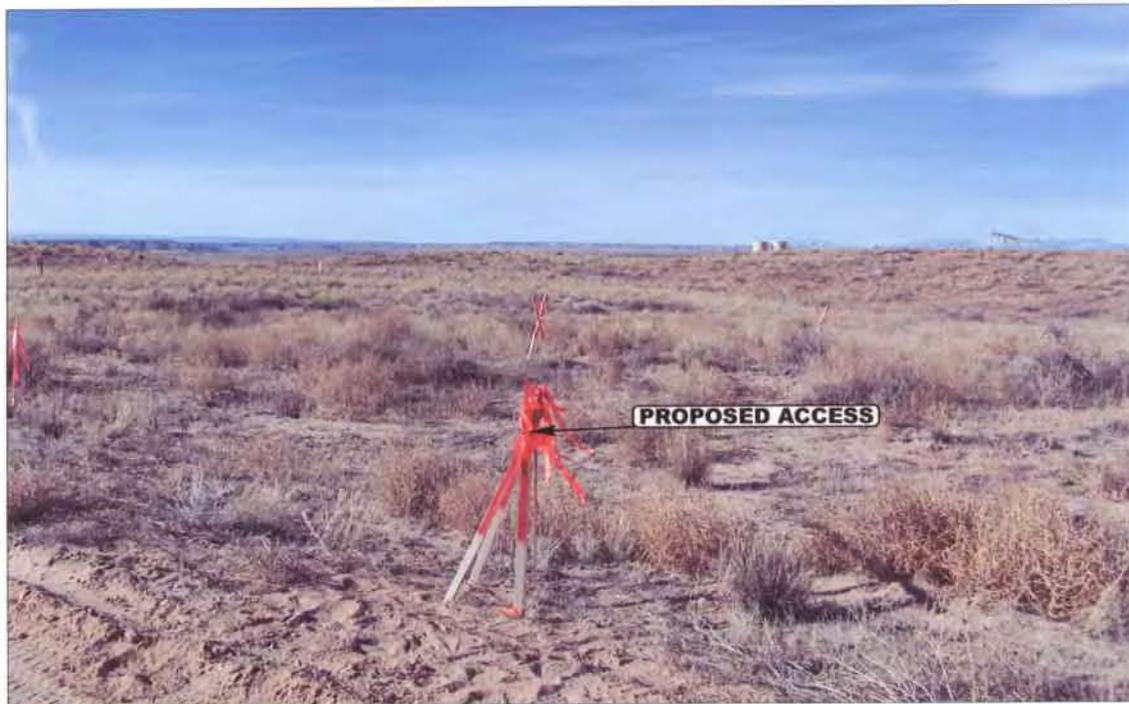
PHOTO: VIEW FROM BEGINNING OF PROPOSED ACCESS
